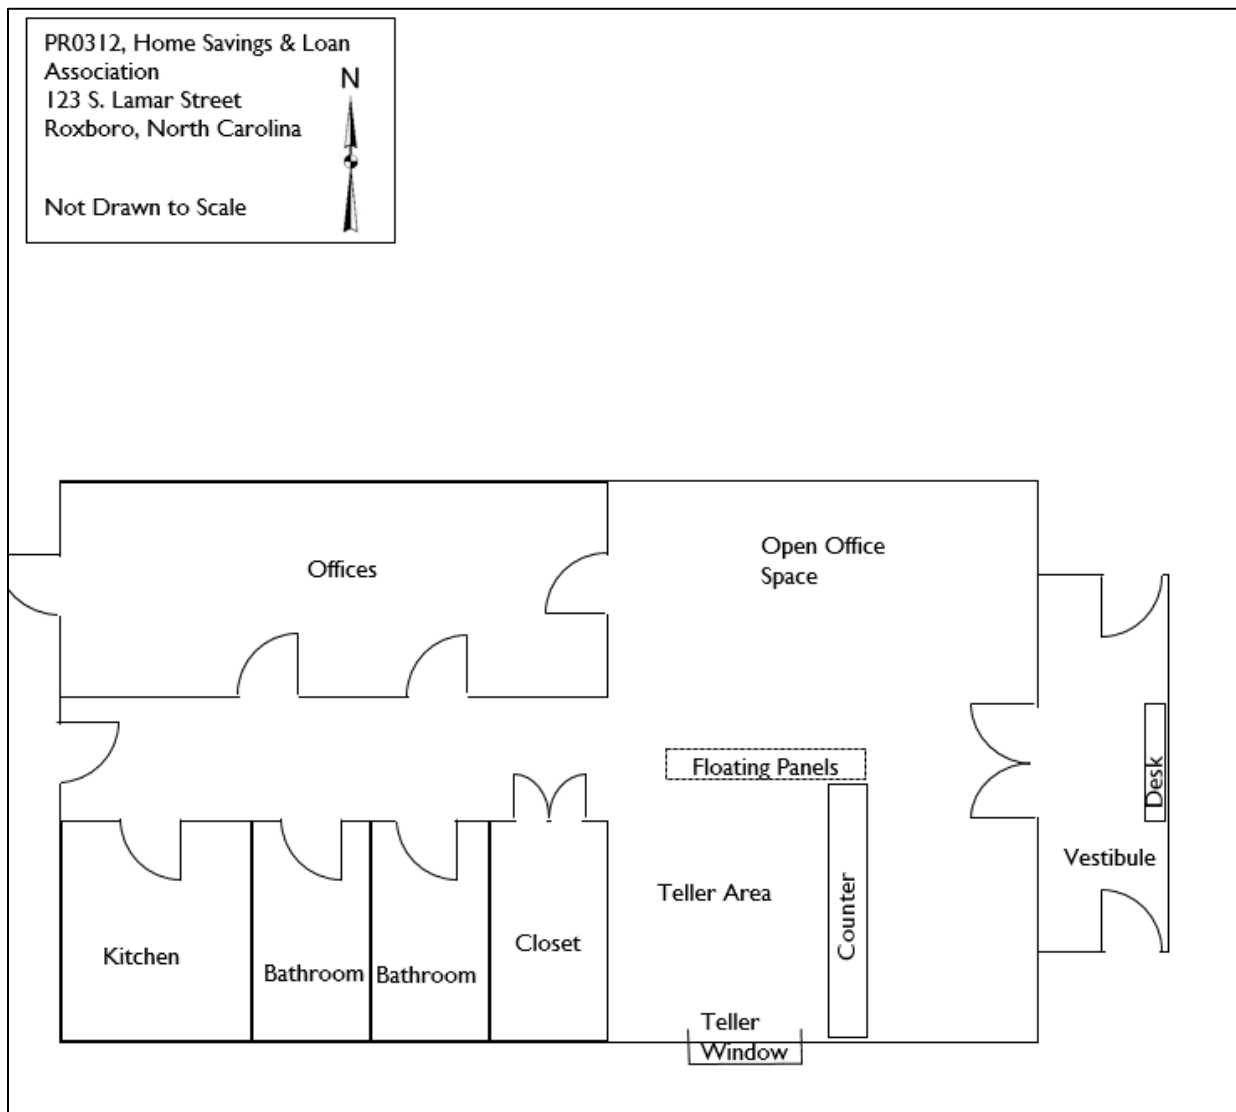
Interior Floor Plan of Home Savings & Loan Association.
